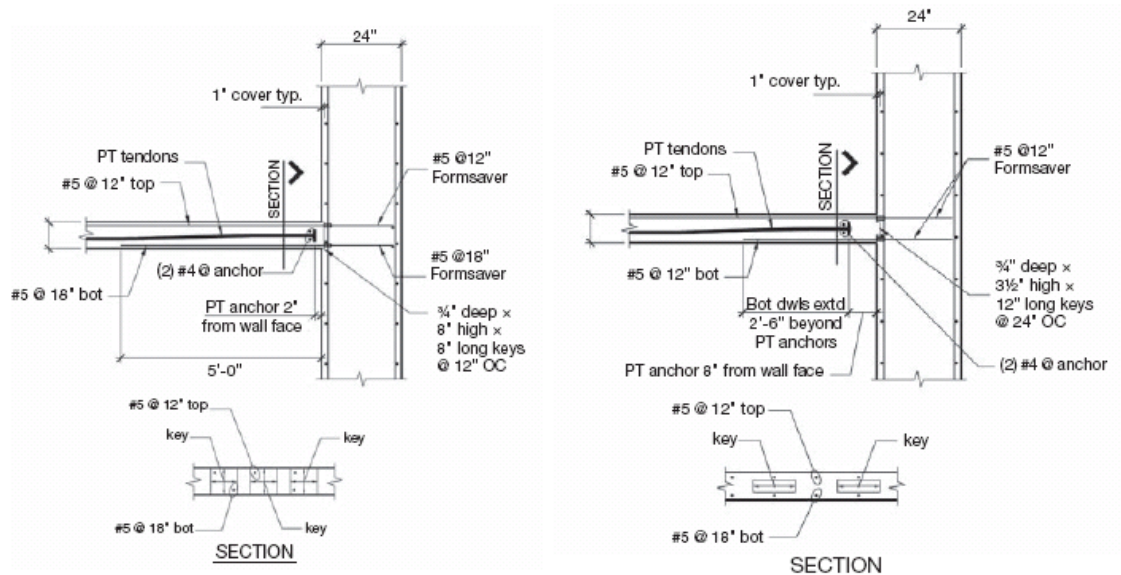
Slab-to-wall connection details for Specimen 1 (left) and Specimen 2 (right) (Klemencic et al., 2006).
